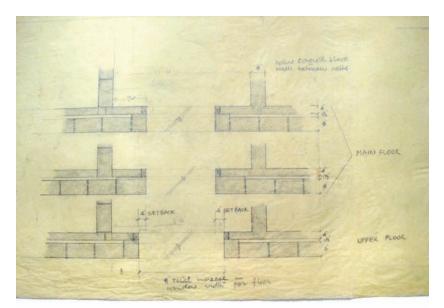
Wall Construction Cells ca. Aug.- Oct. 1968
